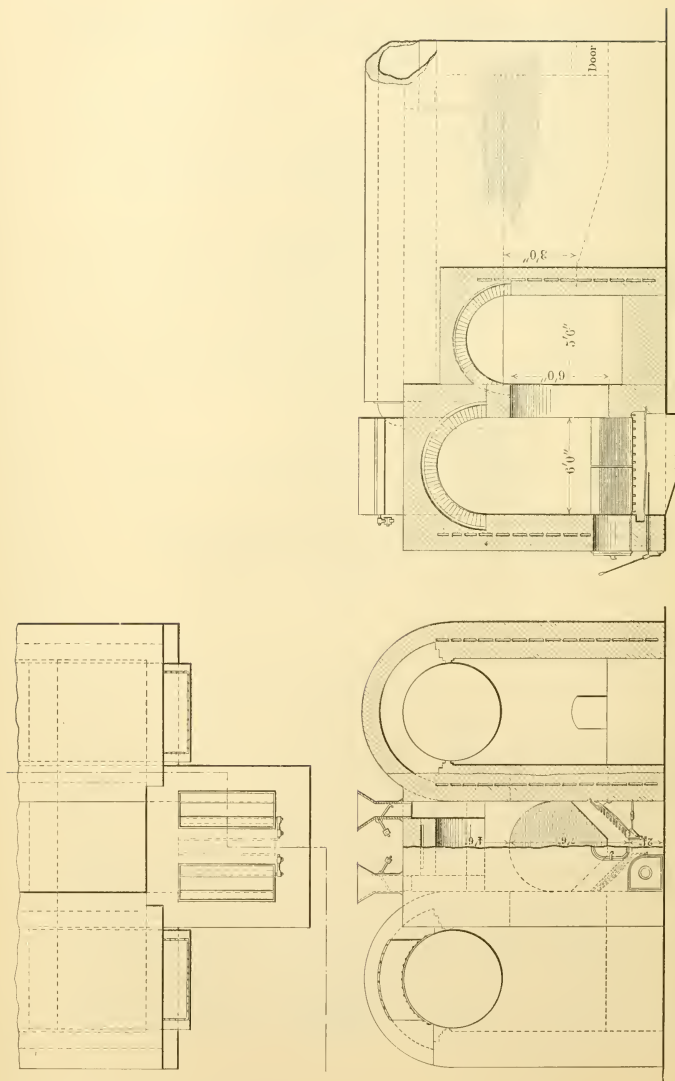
PARTIAL PLAN, SIDE AND END ELEVATIONS OF THE MYERS FURNACE FOR BURNING BAGASSE
